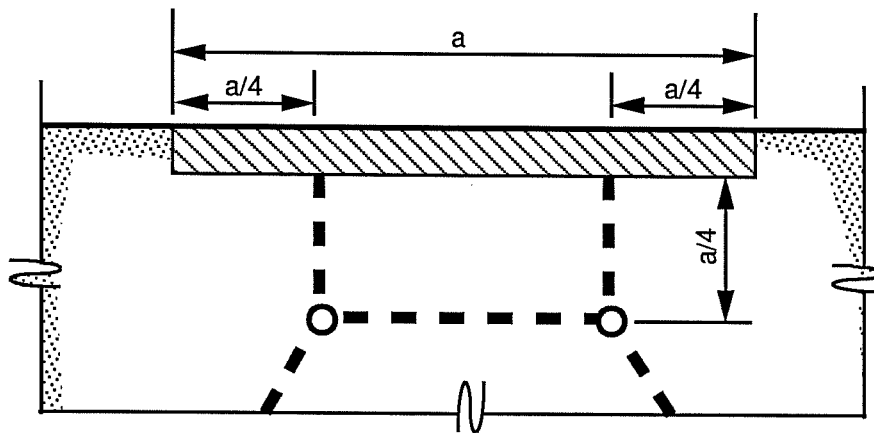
Strut and Tie Model Ahead of Uniformly Loaded Anchor
